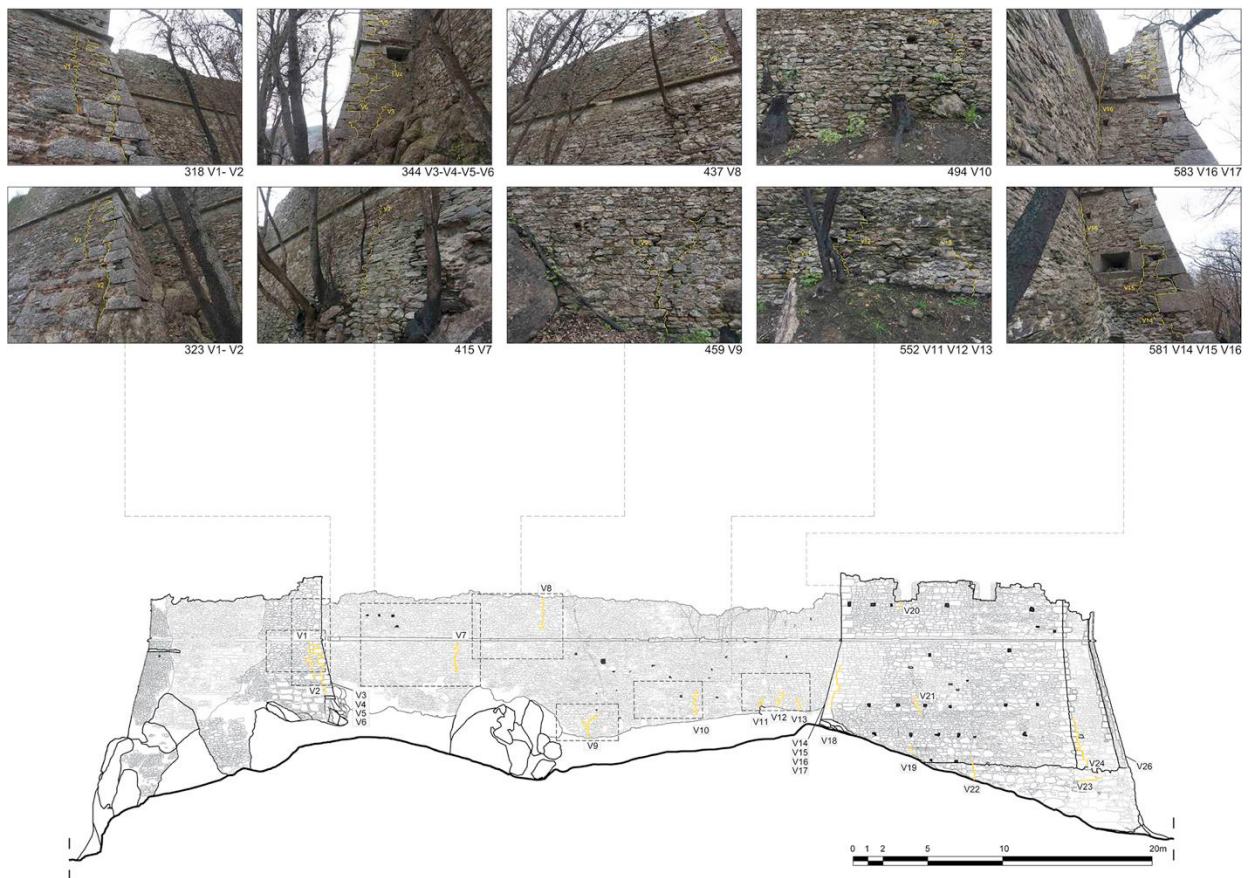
West façade of the fortress with the drawings and the classification of the structural cracks
